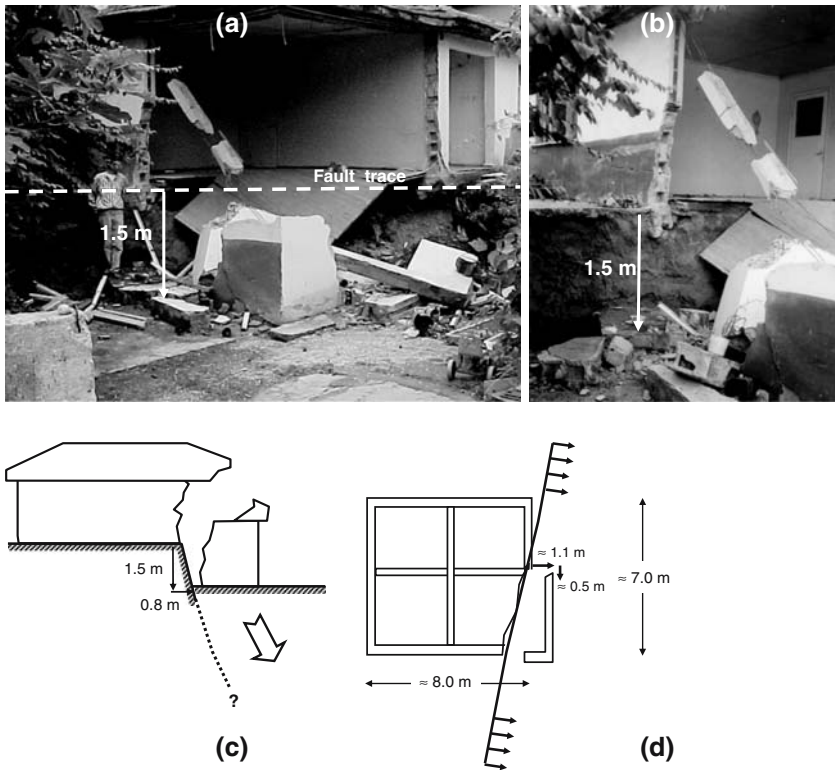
Building 2, single story; Partial Collapse: (a) photo of the fault trace passing through the building (adapted from Youd et al. 2000), (b) photo of the rupture-produced cross section of the building (cinder-block walls directly founded on the ground), (c) schematic cross-section of the building, and (d) plan view of the foundation and the measured offset displacements
